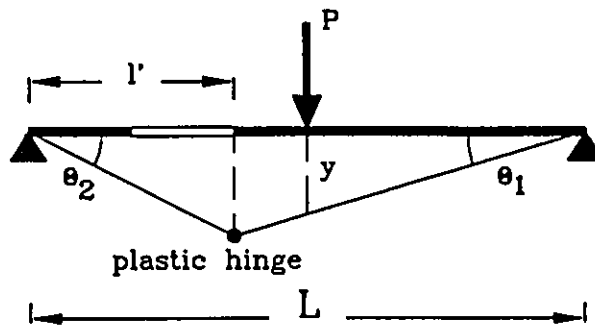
PRESTRESSED BEAM IN ILLUSTRATED DESIGN EXAMPLE
